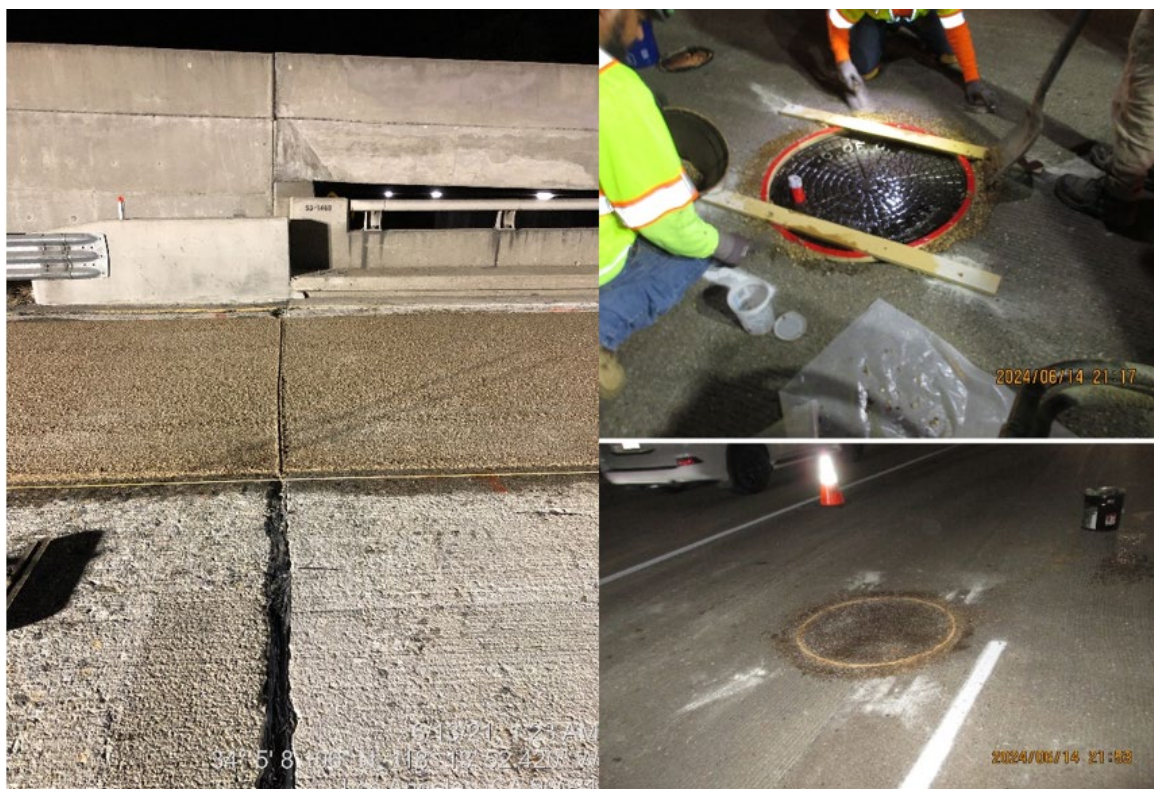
Photo of Joint and Manhole Blocked out and Isolated
